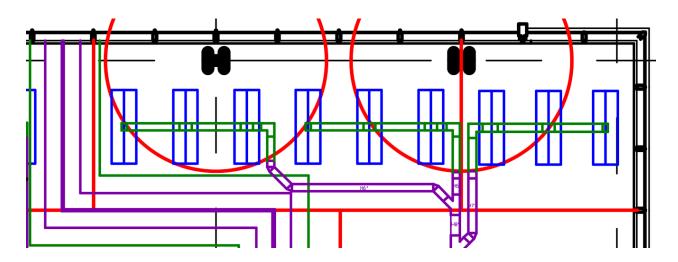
Typical office floor Active Chilled Beam (ACB) layout sample
